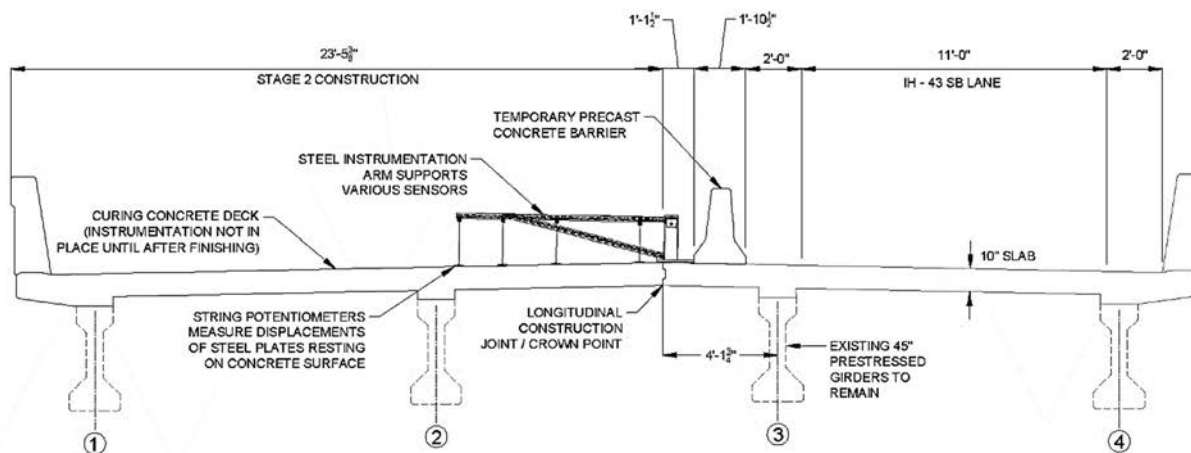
B-64-123 Cross section of bridge B-64-123 during stage 2 construction (looking
